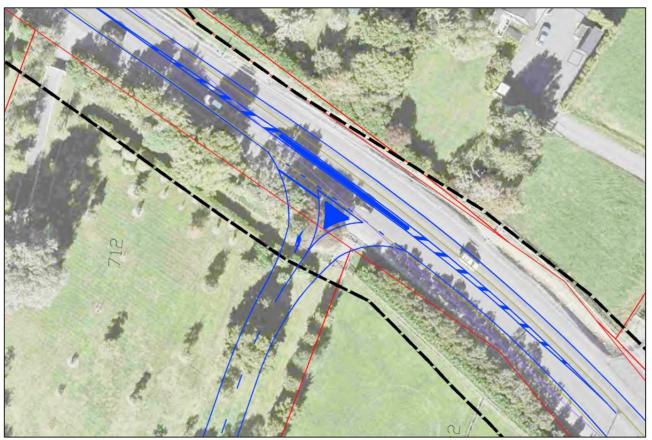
Proposed New Site Access Intersection at 712 Whitford Maraetai Road
